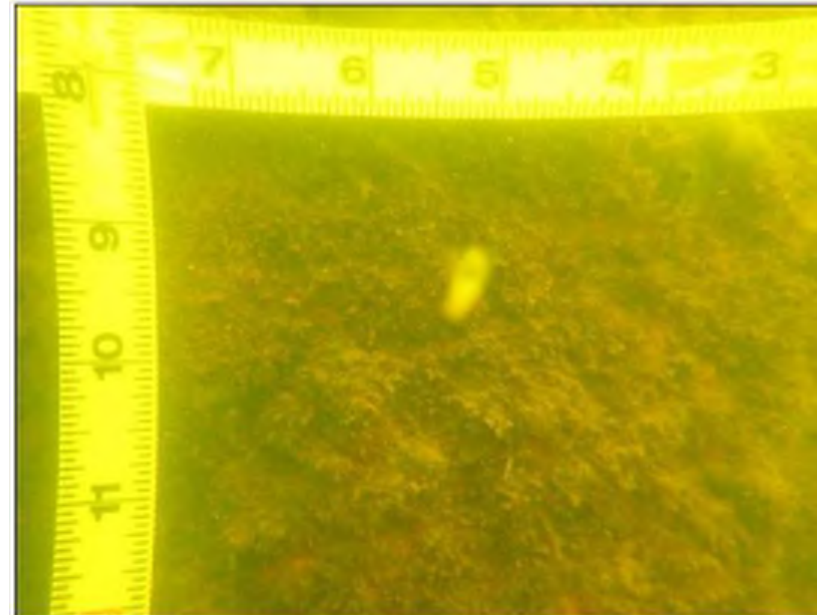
U.S. Coast Guard Dock and Pier Dolphins
